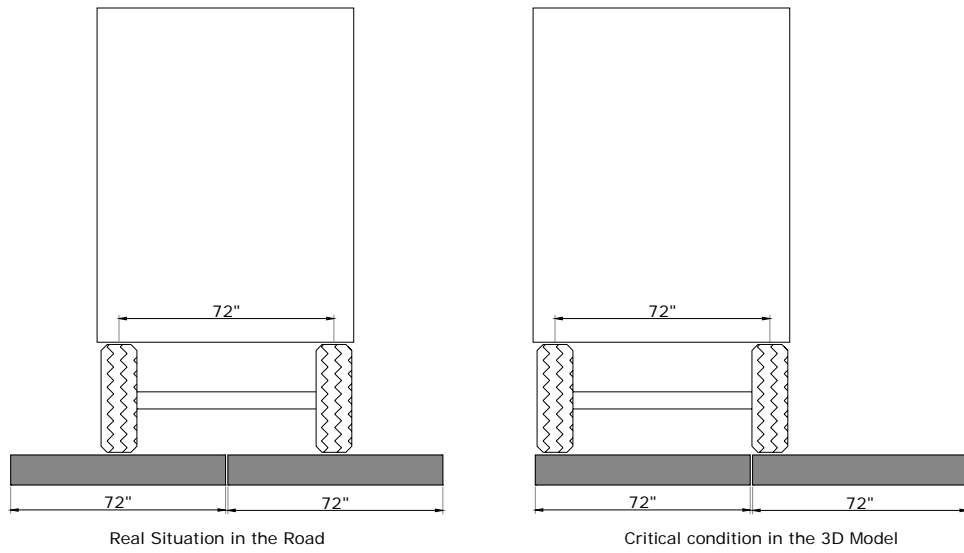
Axle Load Positioned on Slabs with 6-ft Joint Spacing.
